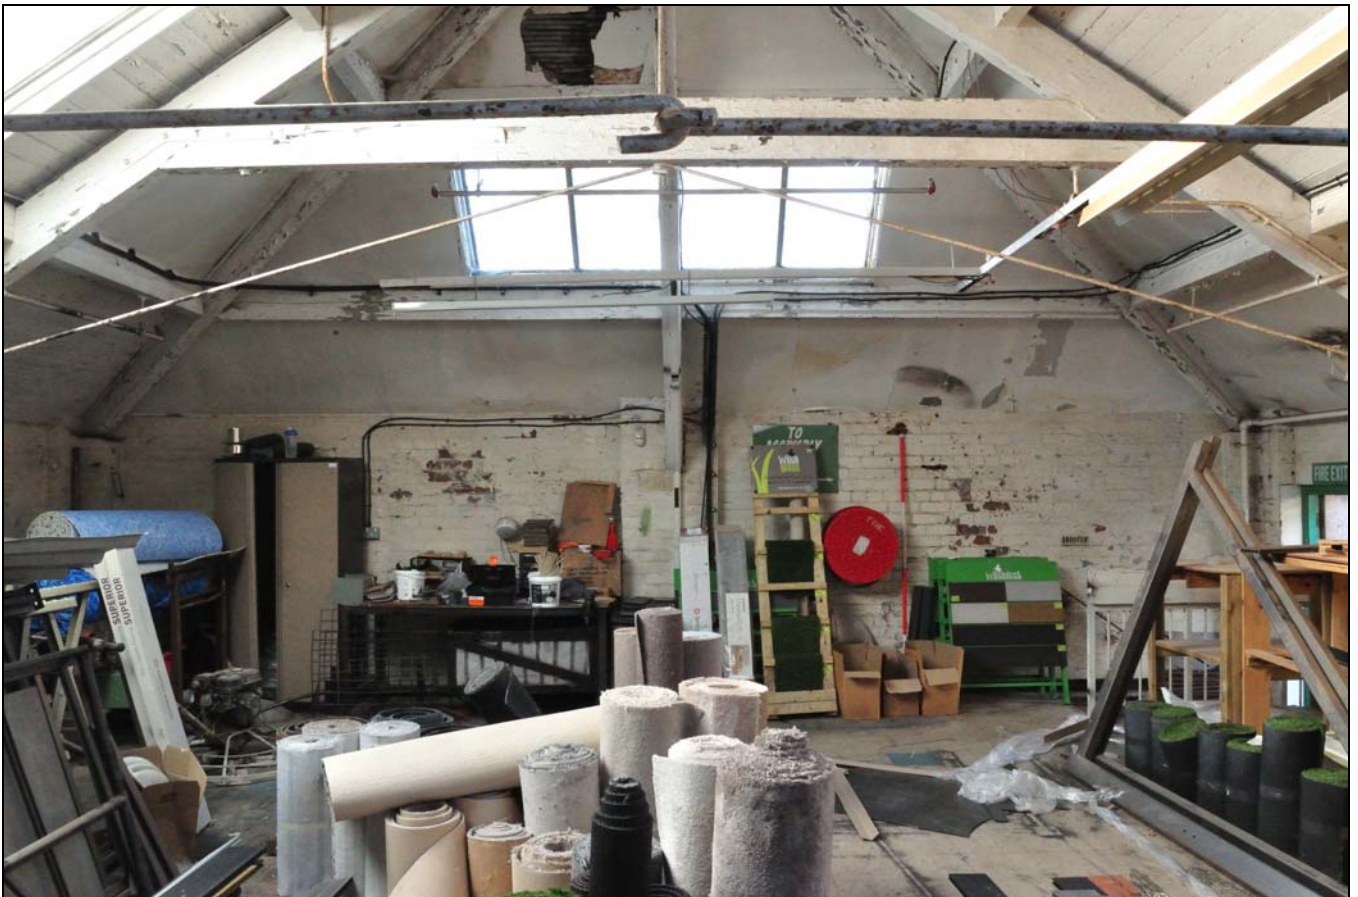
Detached weaving shed: roof structure to warehouse, looking north-west
